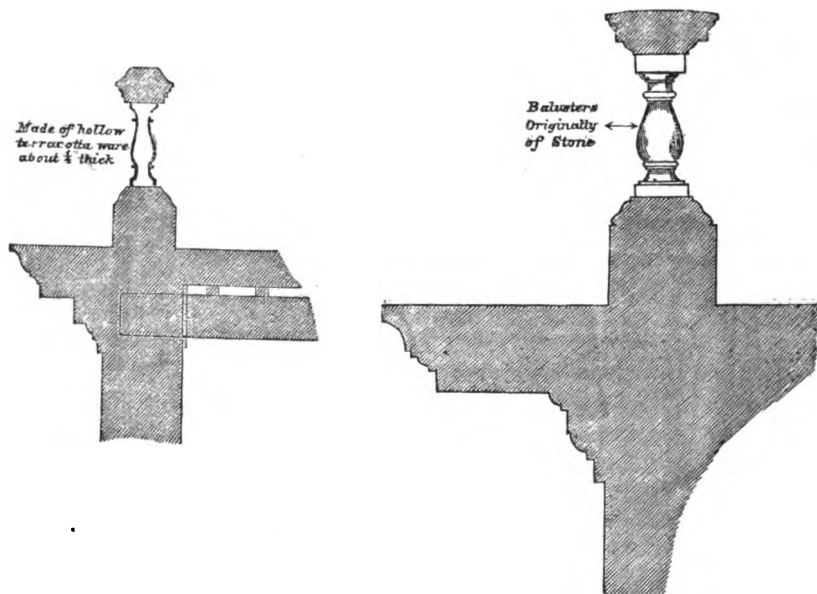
Section of roof, cornice, and parapet of a private house, Calcutta.
